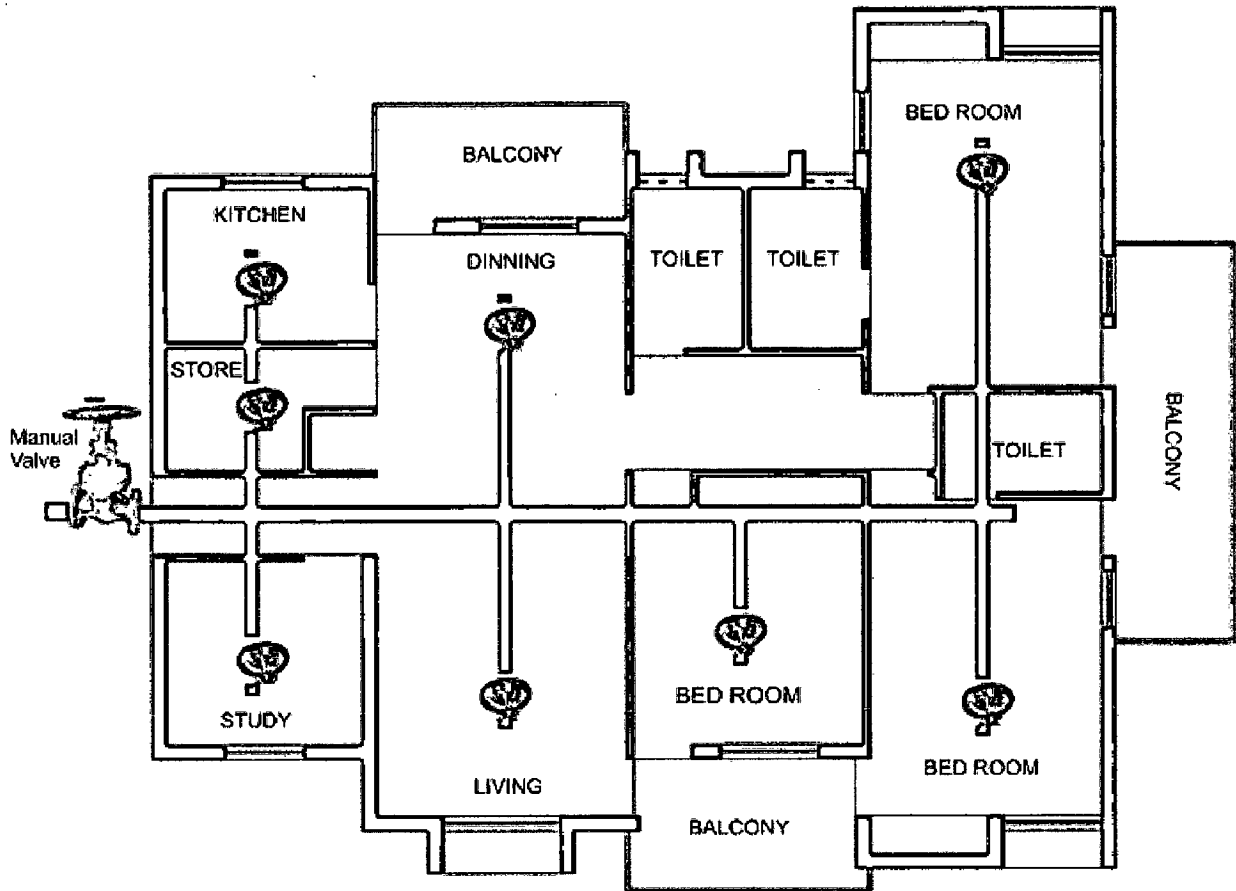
Layout of Fire Sprinkler System for Hill View Building Apartment
